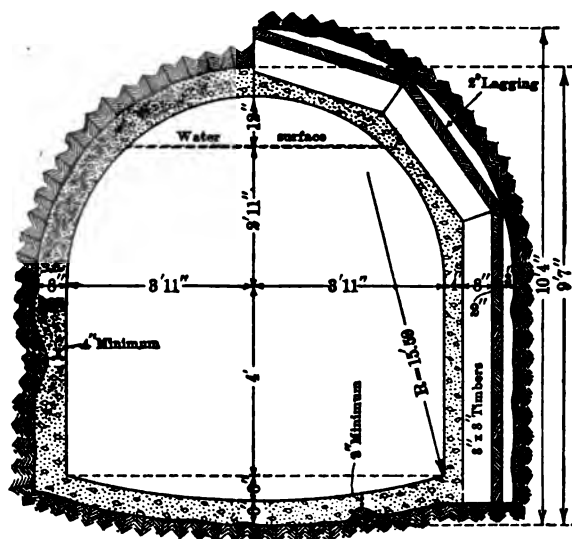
Cross section of a typical tunnel, Los Angeles Aqueduct.
